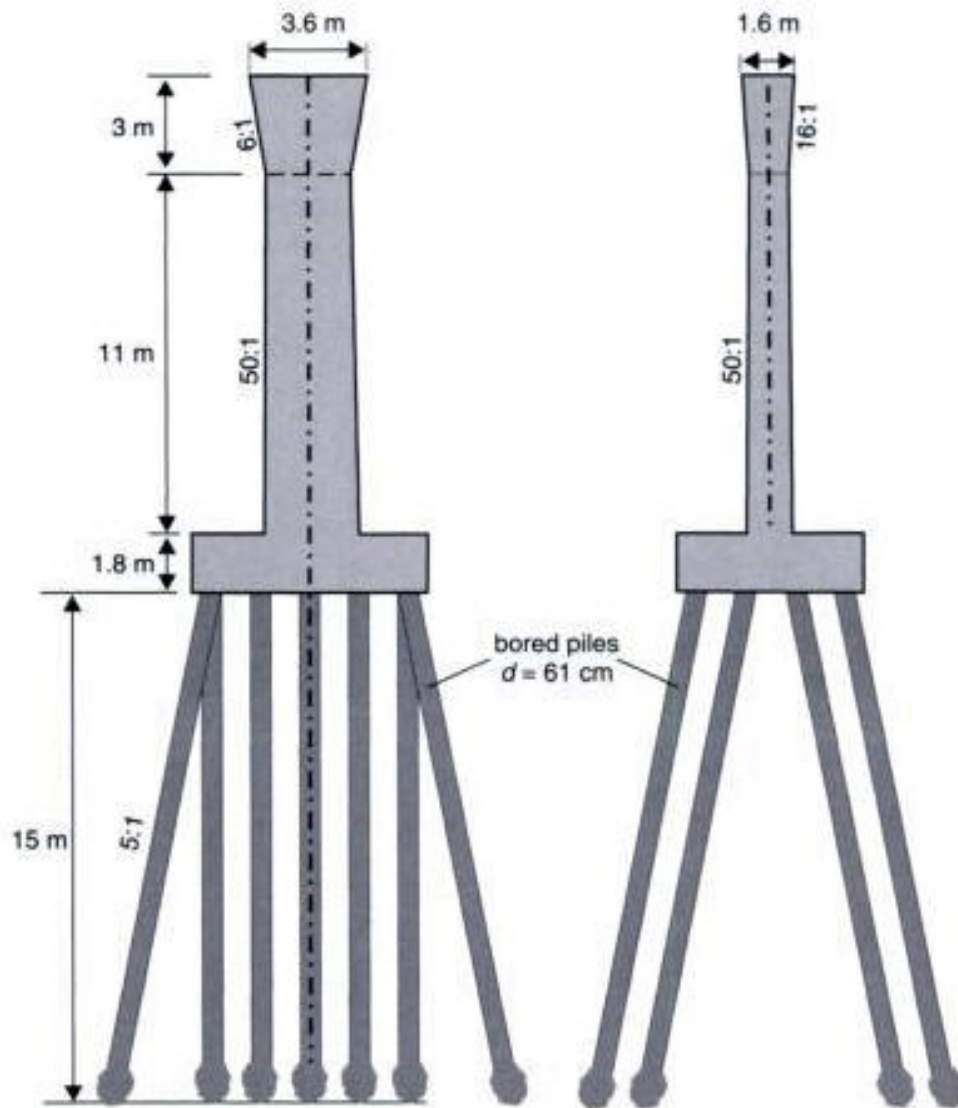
Pile foundation of a bridge column (Schornbachtalbrücke [21])
